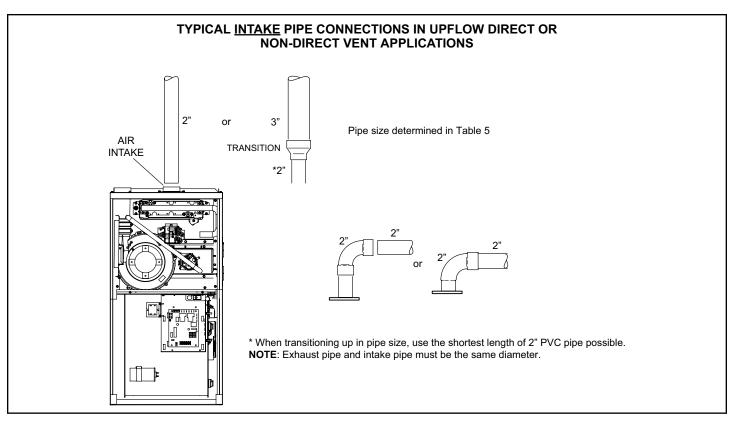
Typical Air Intake Pipe Connections in Upflow Direct Vent Applications
